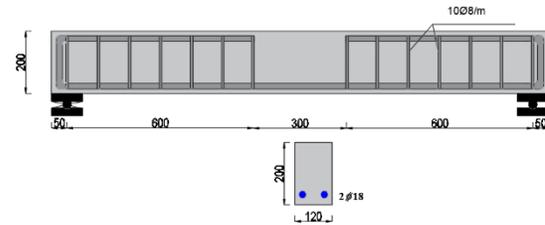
Details of -VB1 (B0) beam by Atta et al. [12]
